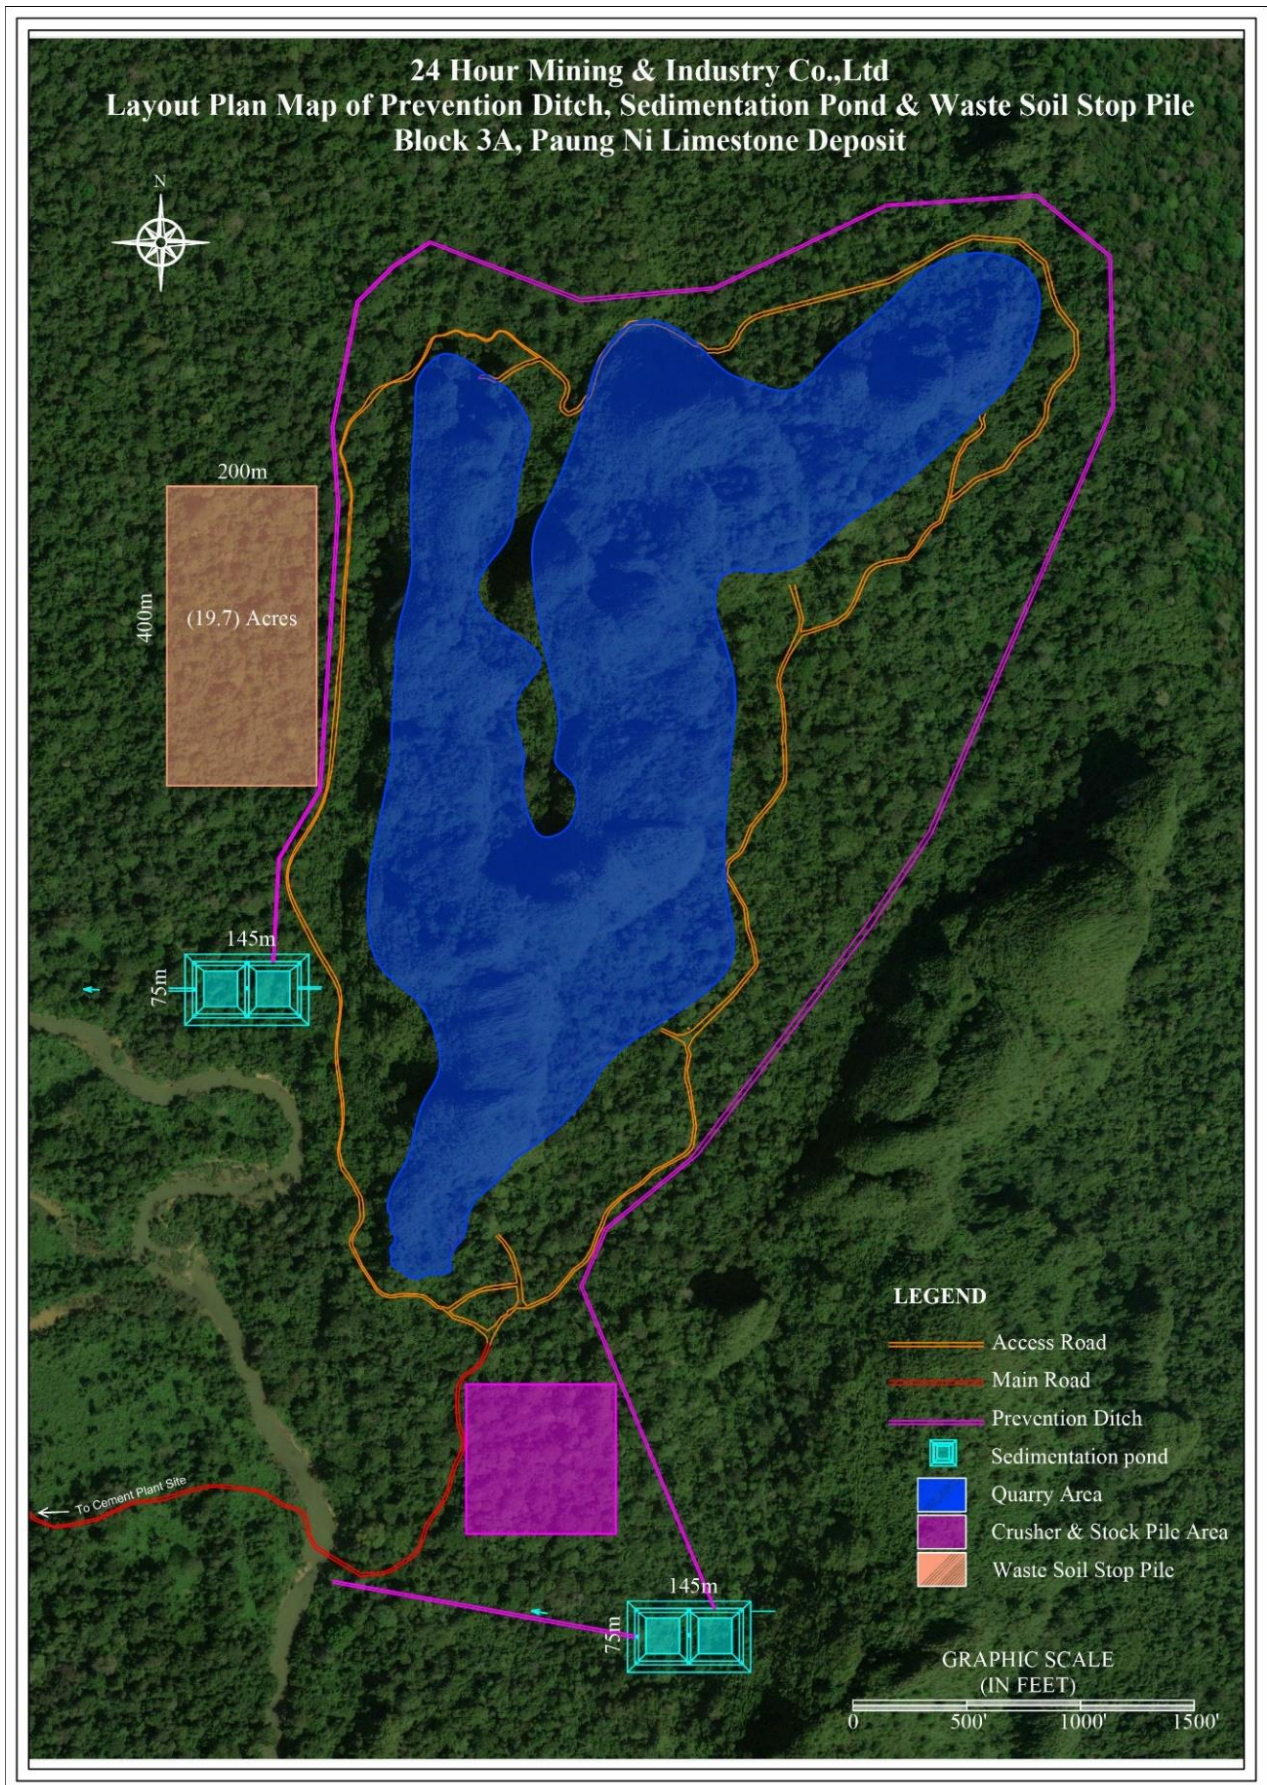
14 Layout plan map of Quarry area, Prevention ditch line, Sedimentation Ponds and Crusher & stock pile site and Access Road of Limestone Mining Area.
